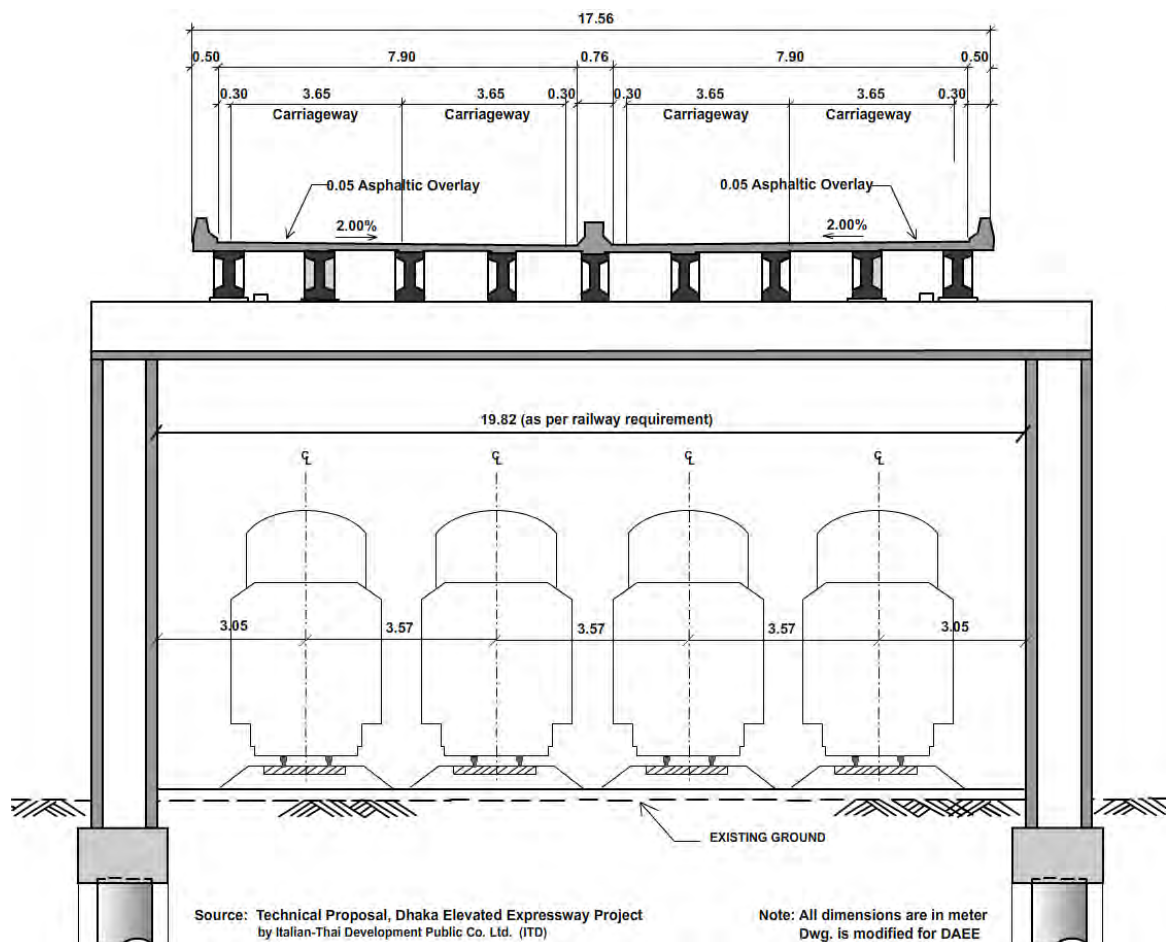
Main Viaduct – I-girder System along Railway Corridor
